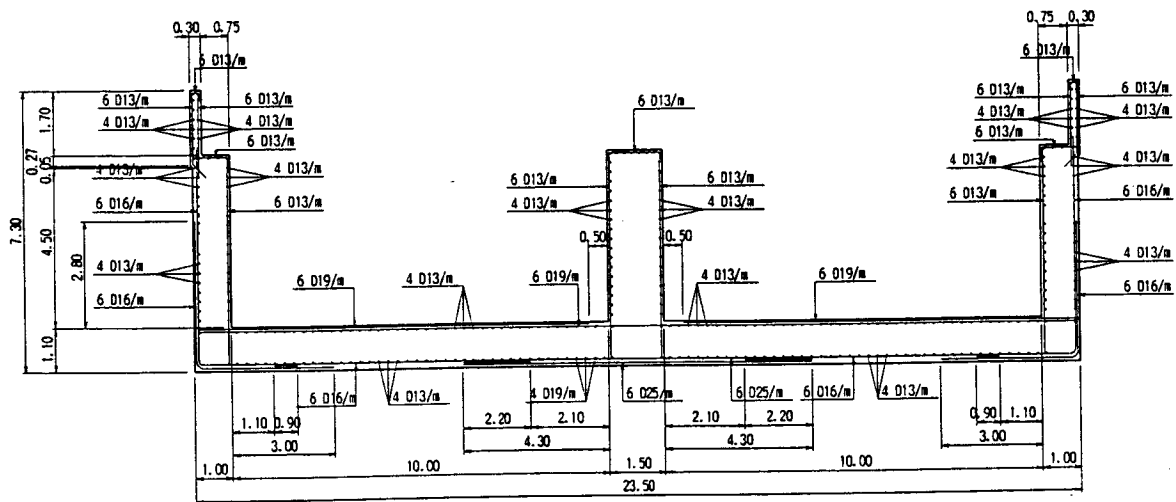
Arrangement of Reinforcement for Infrastructure of O/M Bridge
